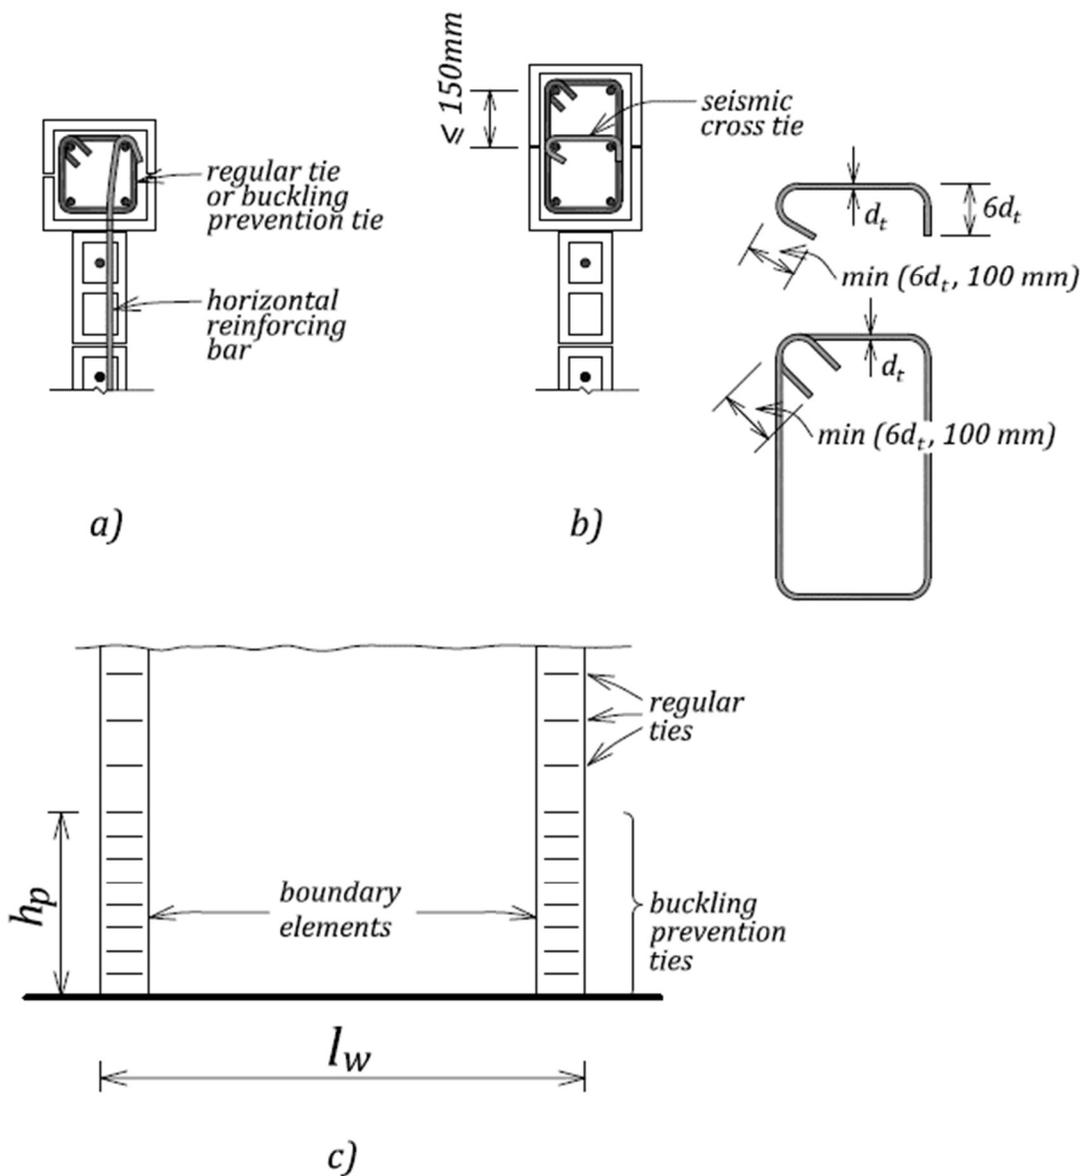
Reinforcement arrangement in a boundary element: a) cross-section showing vertical and transverse reinforcement; b) seismic cross ties, and c) wall elevation showing distribution of ties over the height of a boundary element.
